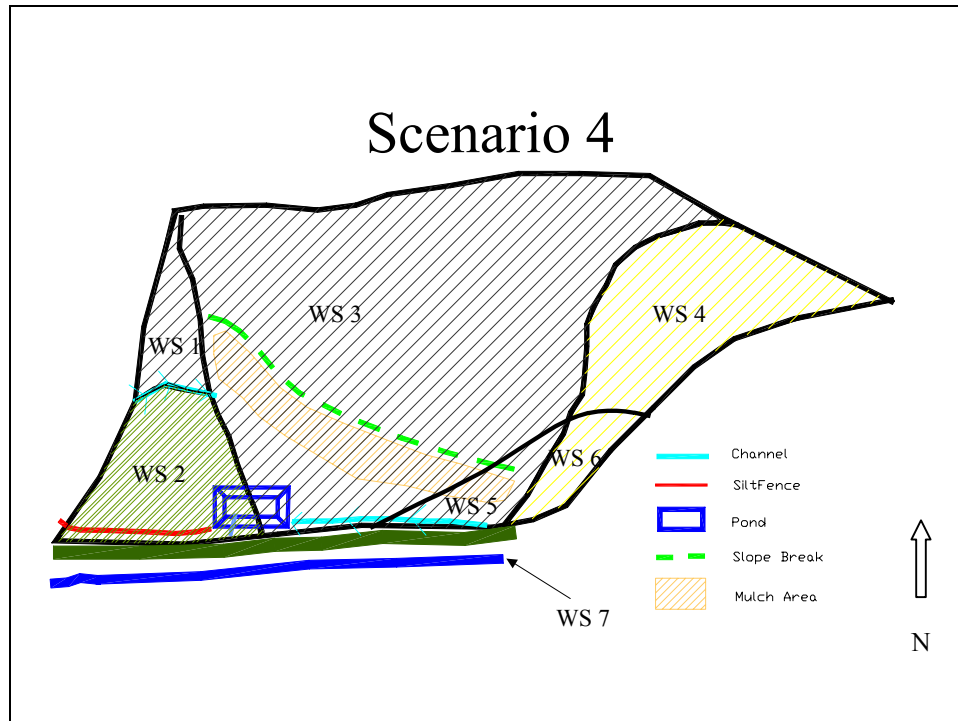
A- 11 Site configuration with break in slope upgradient of pond.
